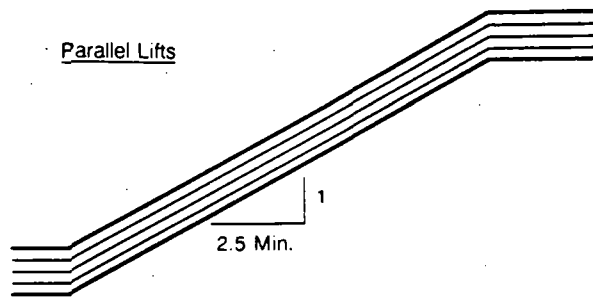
Liner construction on side slopes with horizontal and parallel lifts.
